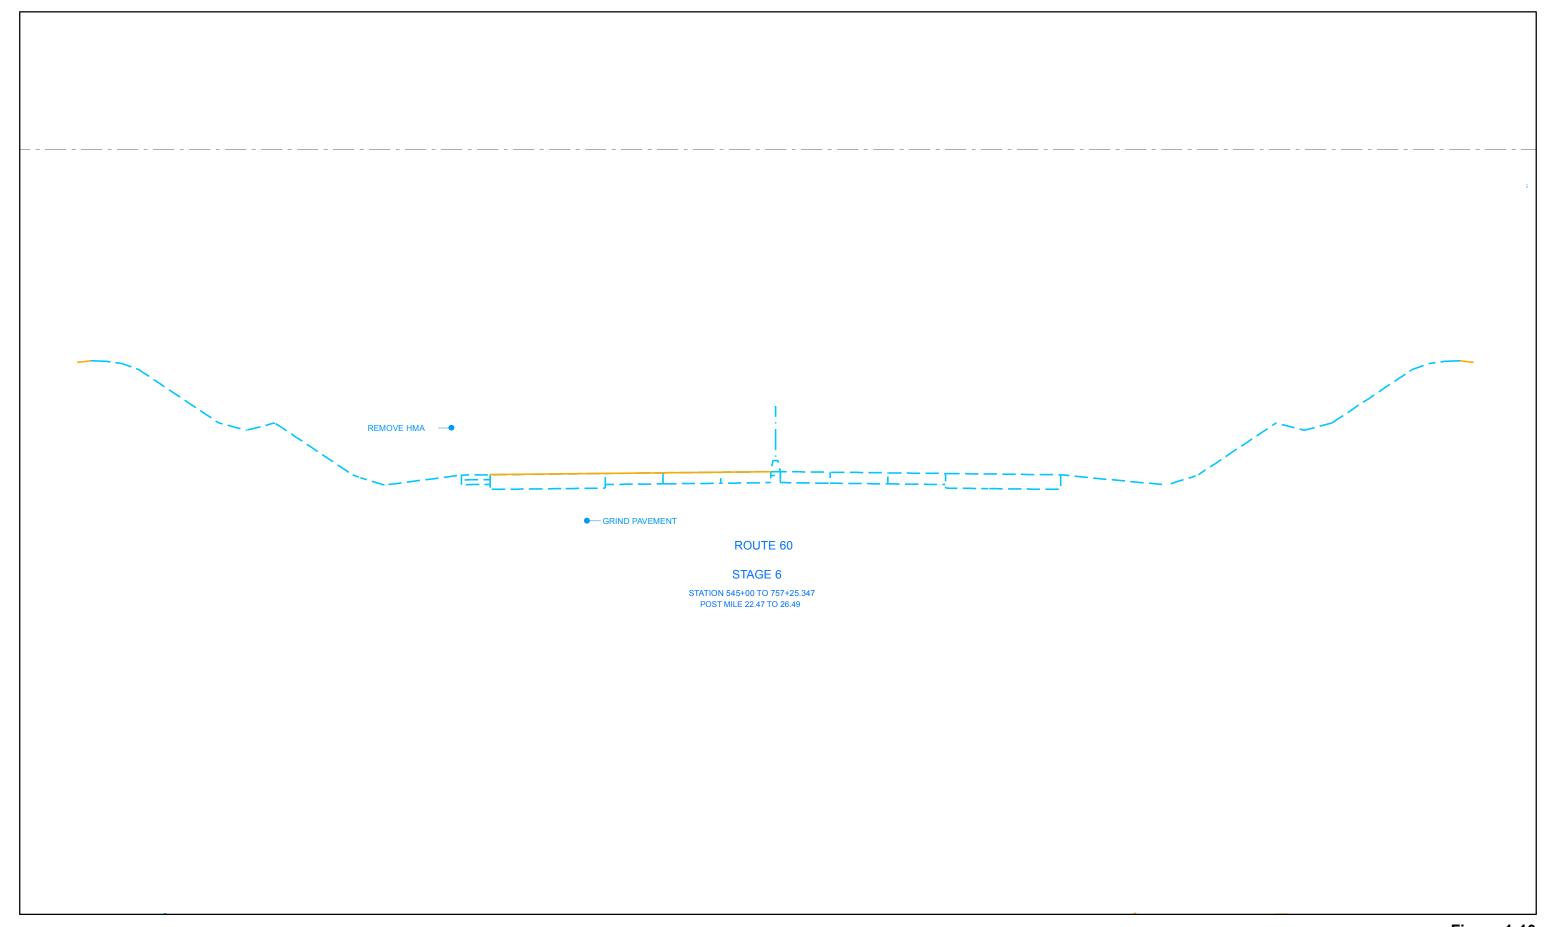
Construction Stage 6 State Route 60 Truck Lanes Project
